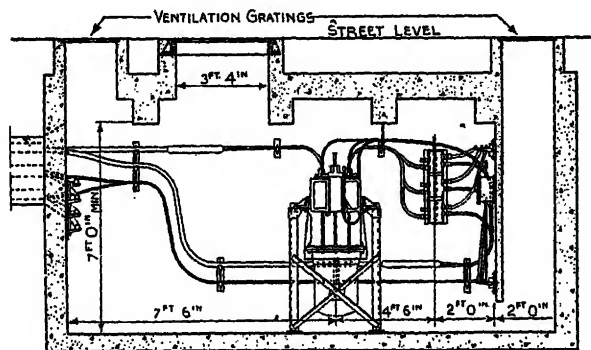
SECTIONAL ELEVATION OF TRANSFORMER VAULT SHOWING OIL CIRCUIT BREAKER, JUNCTION BOXES AND ARRANGEMENT FOR VENTILATION
